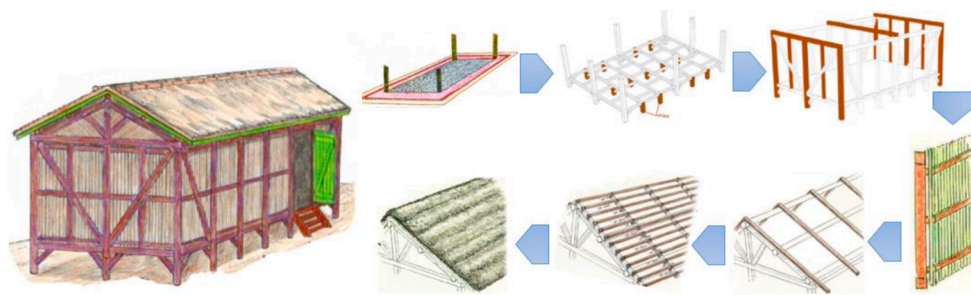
Construction steps for a *Falafa* type traditional wooden house. Adapted from [25].
